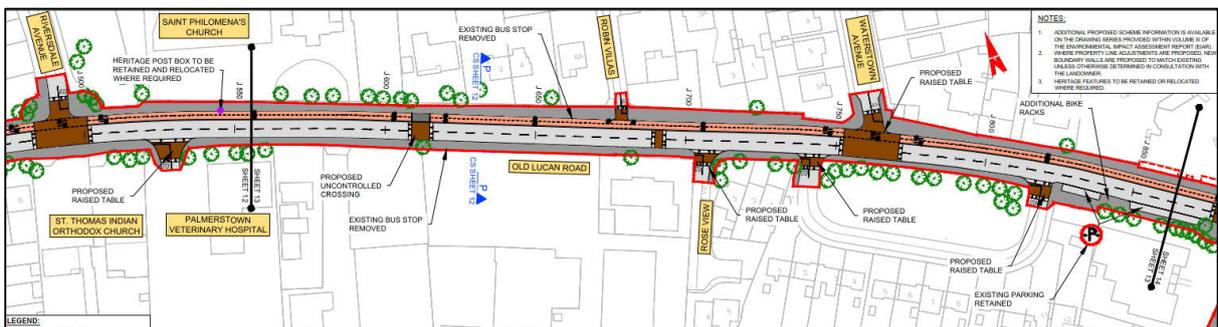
Proposed Design - Old Lucan Road from Riverside Avenue to Palmerstown village centre
